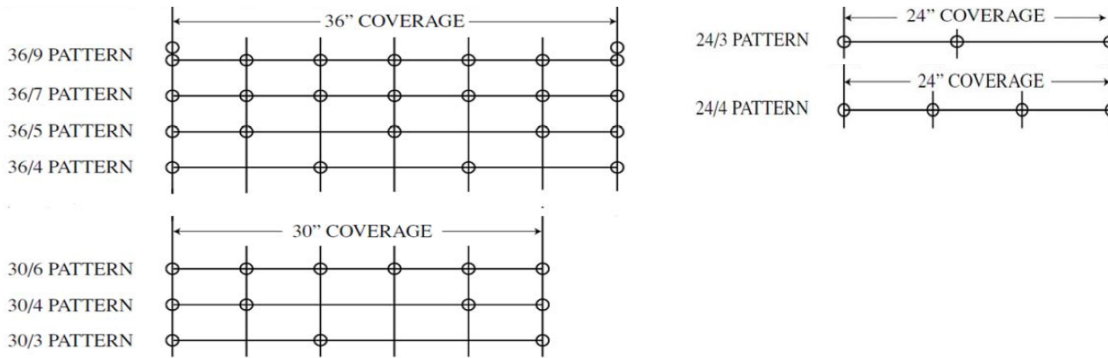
TEKS SUPPORT FASTENER LAYOUT
